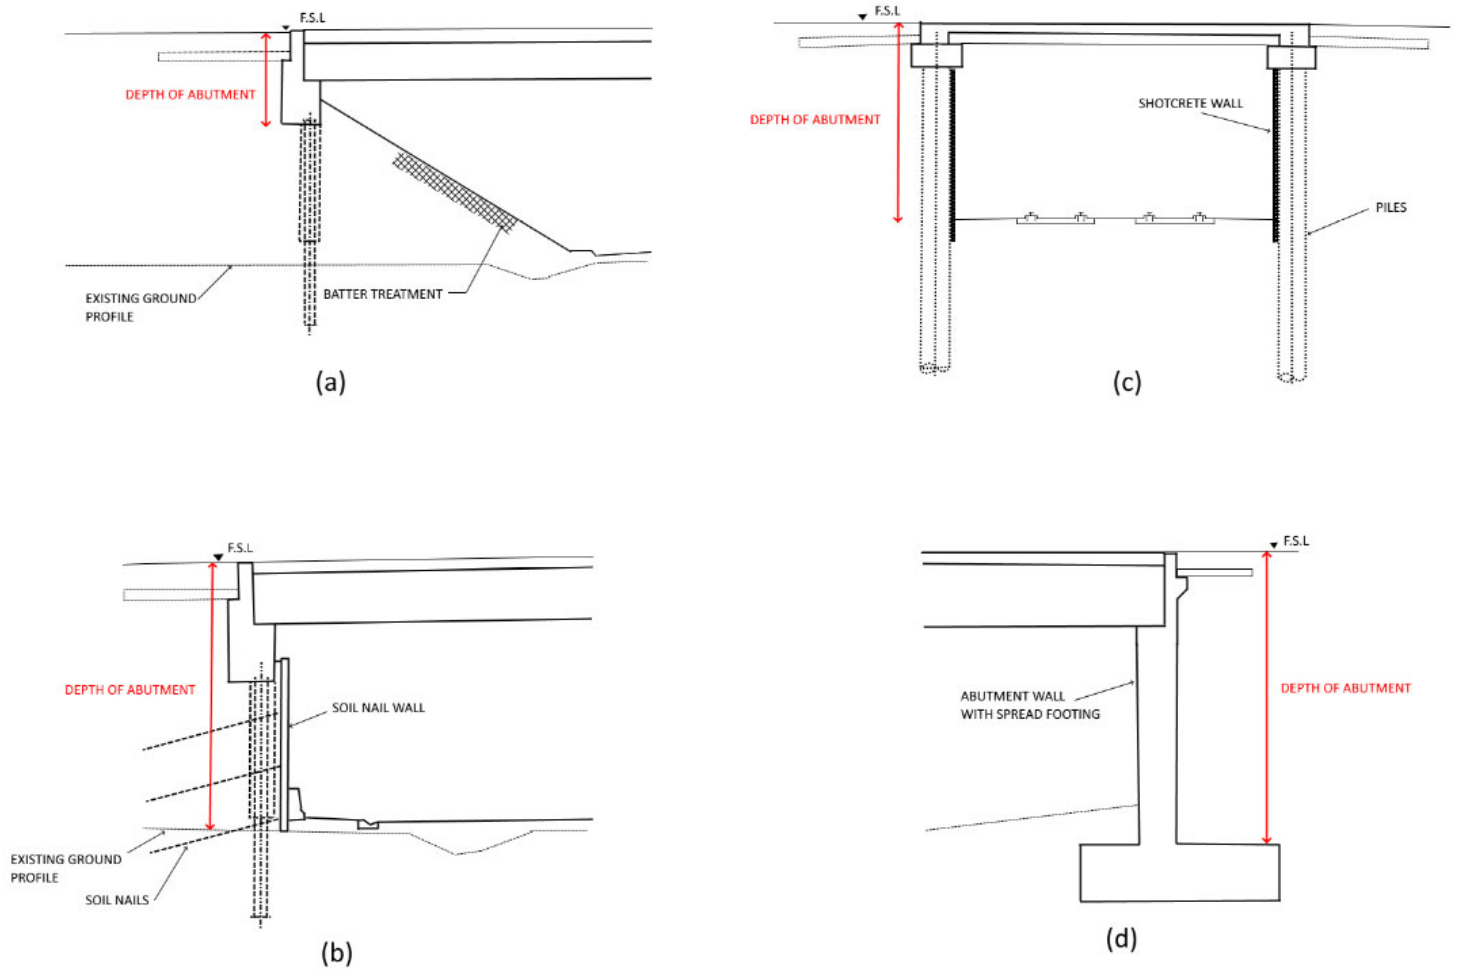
Depth of Abutment: (a) Spill through abutment; (b), (c) and (d) Vertical wall abutment
